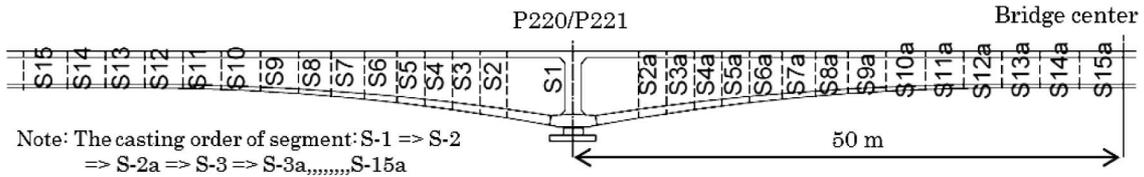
Order of segment casting by balanced cantilever construction methodology.
